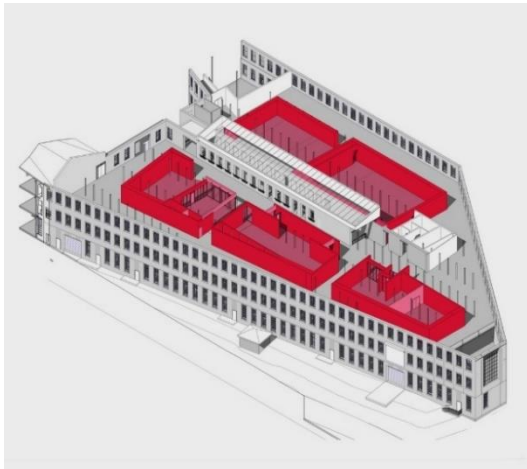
NEW PARTITION WALLS WERE INSERTED TO CREATE GALLERY SPACE (ARCHDAILY, 2017)
